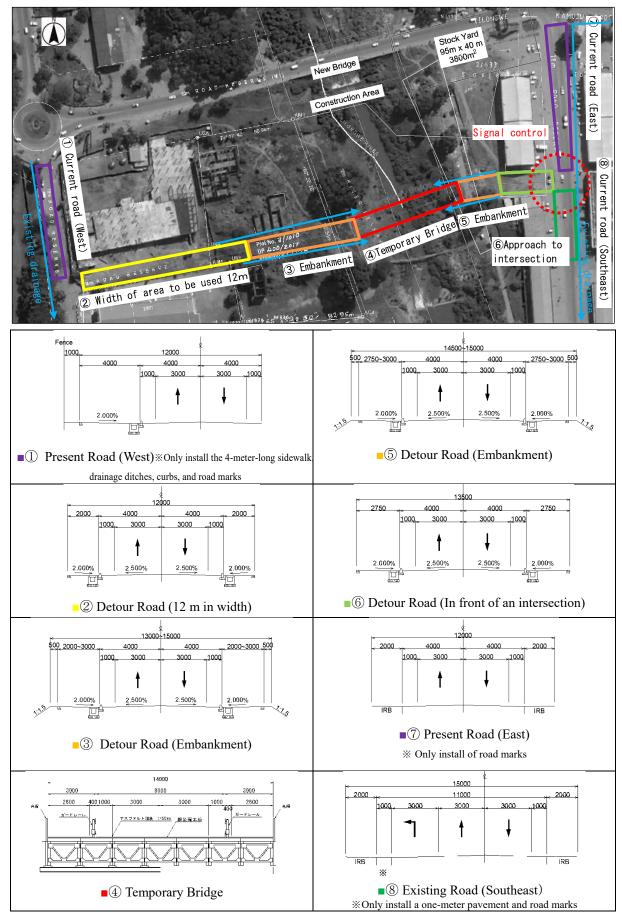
Site Plan and Cross-Sectional Drawing for Each Section of the Detour Road
